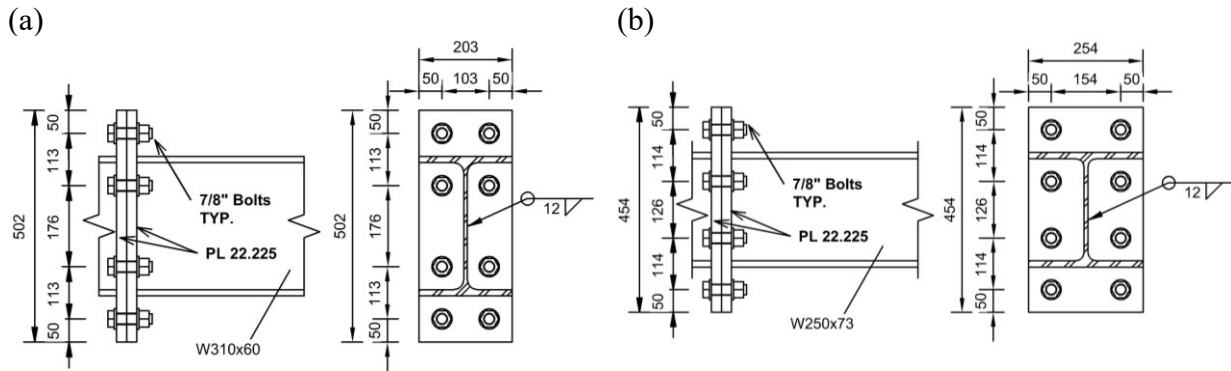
Wide-flange beam splice connections: (a) Specimen 1; (b) Specimen 2 (dimensions in mm)
